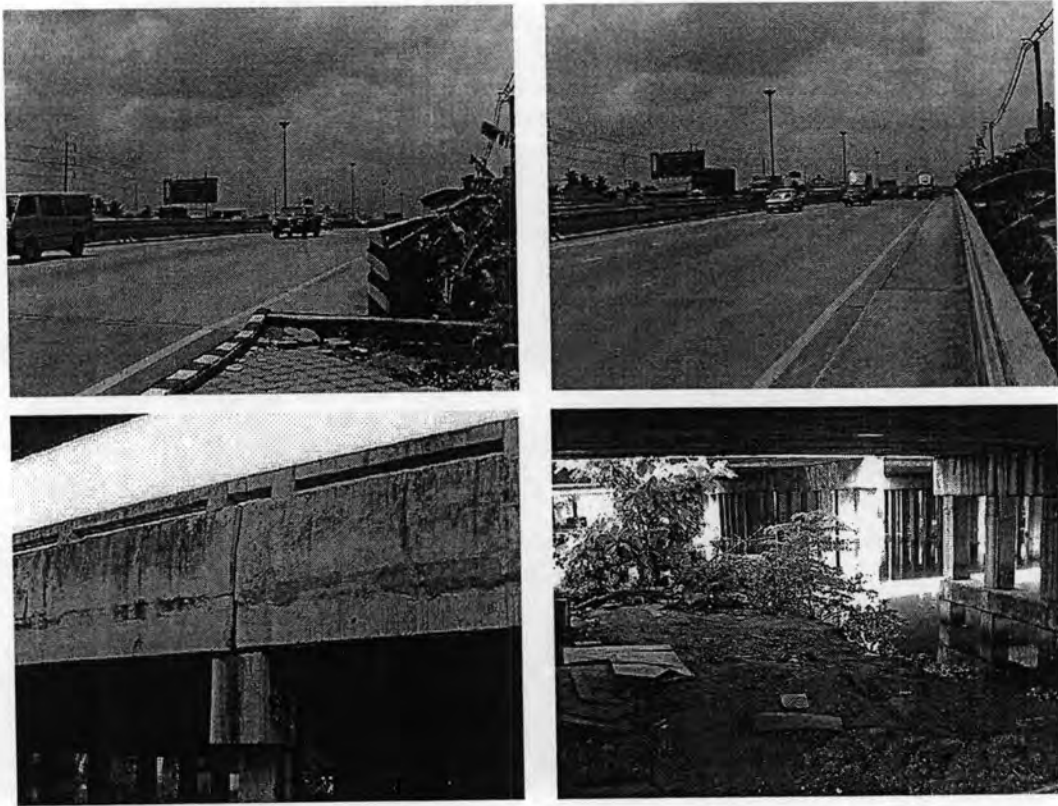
Photographs of tested bridge in the west outer-ring roads at KM28+170.31 crossing Bang-Noi canal
